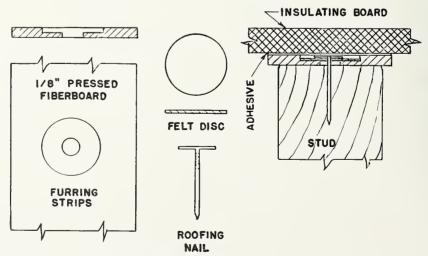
Use of special 1/8-inch furring strips to form a floating wall surface.
